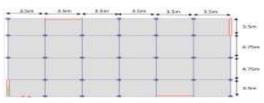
Modeling of Ten Story Building and Plan of Building with 0.5% Shear Wall Ration in Each Direction
